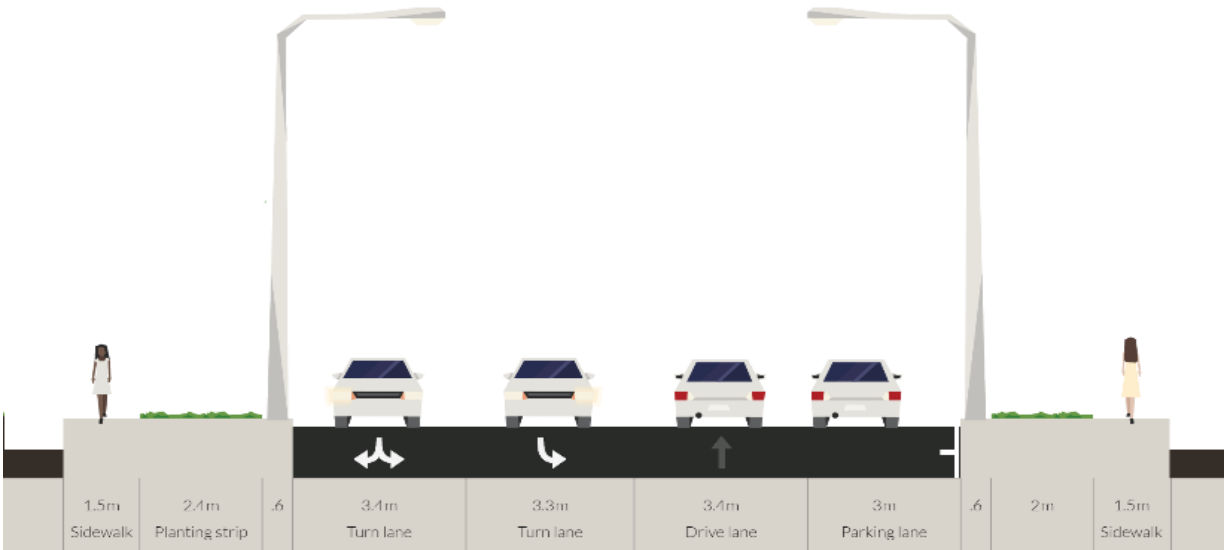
Existing Cross-section of Doris Ave. at Sheppard Ave. E (Looking North)
